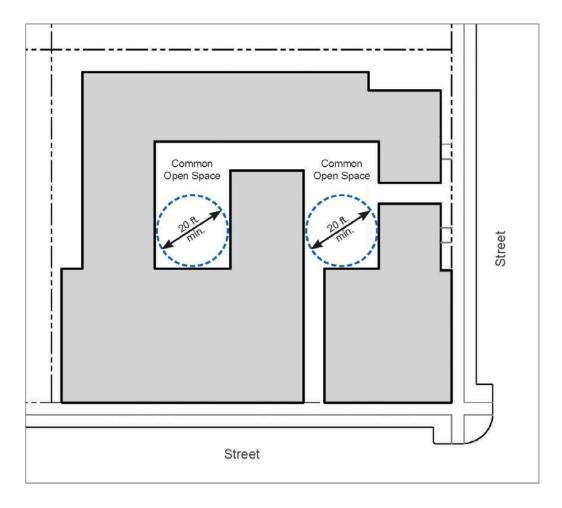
I.1.B: MINIMUM REQUIRED COMMON OPEN SPACE DIMENSION
